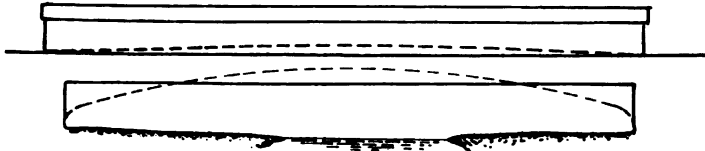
COMPARISON OF AN ARCH AND GIRDER BRIDGE IN A FLAT LOCATION, 60-FT. SPAN.
